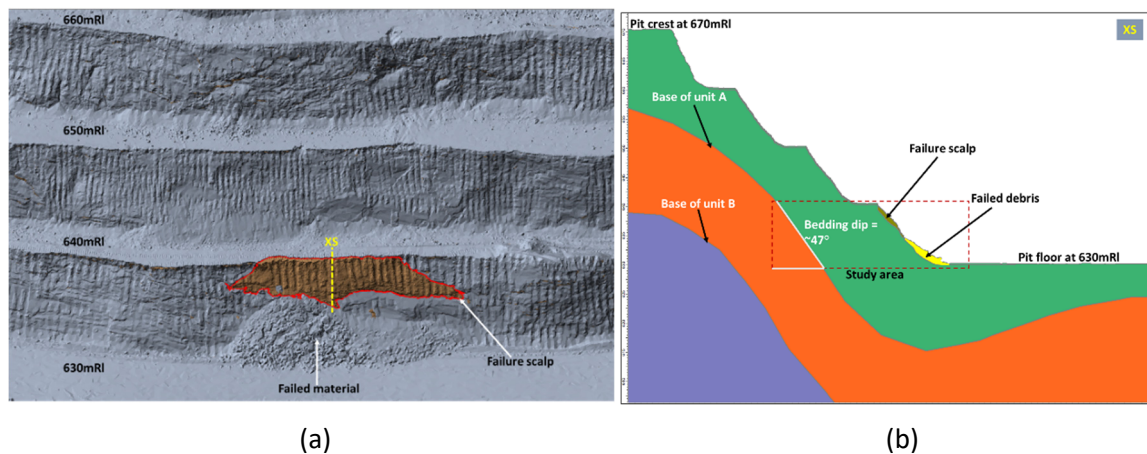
Overview of a single batter crest failure in a structurally controlled pit slope. (a) 3D view looking south; (b) 2D geological cross-section through failure
